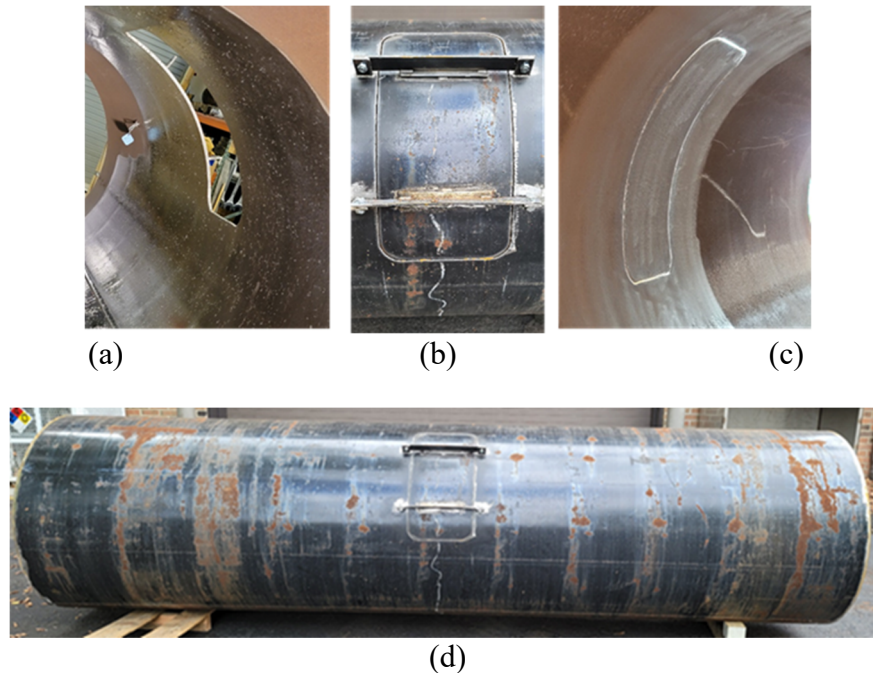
The test pipe with 12" × 24" cut-out before CFRP installation
